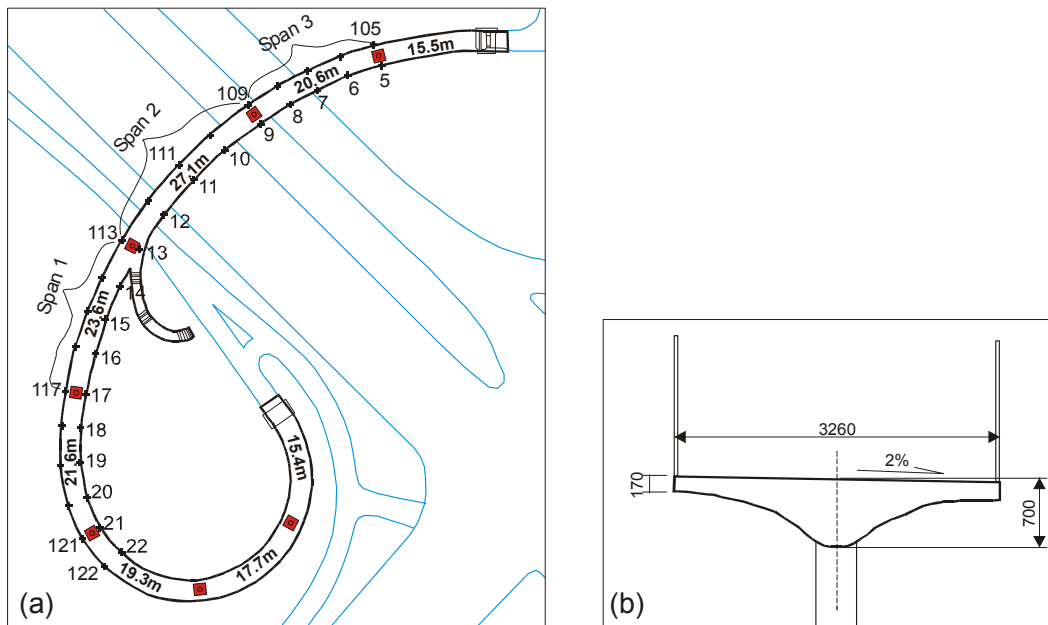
RCF: (a) plan view including test point numbers and (b) cross section (not to scale).
